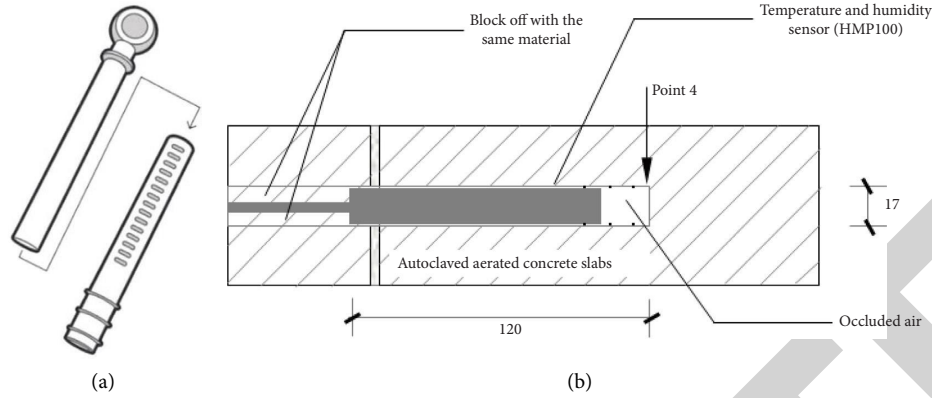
Installation method for sensors inside external wall mortar layer. (a) Embolize the long rubber into the plastic pipe. (b) Detailed construction drawing of sensor inside the mortar layer (/mm, point 4).
